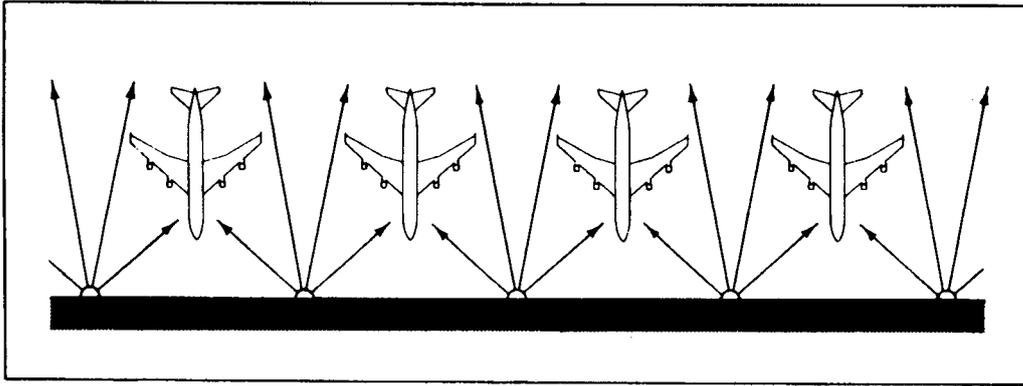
Typical arrangement and aiming for nose-in parking
